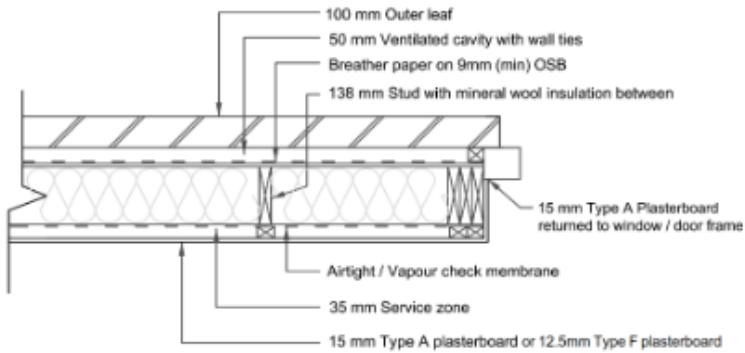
Wall Type 1 (WT1) - Service Cavity Wall
